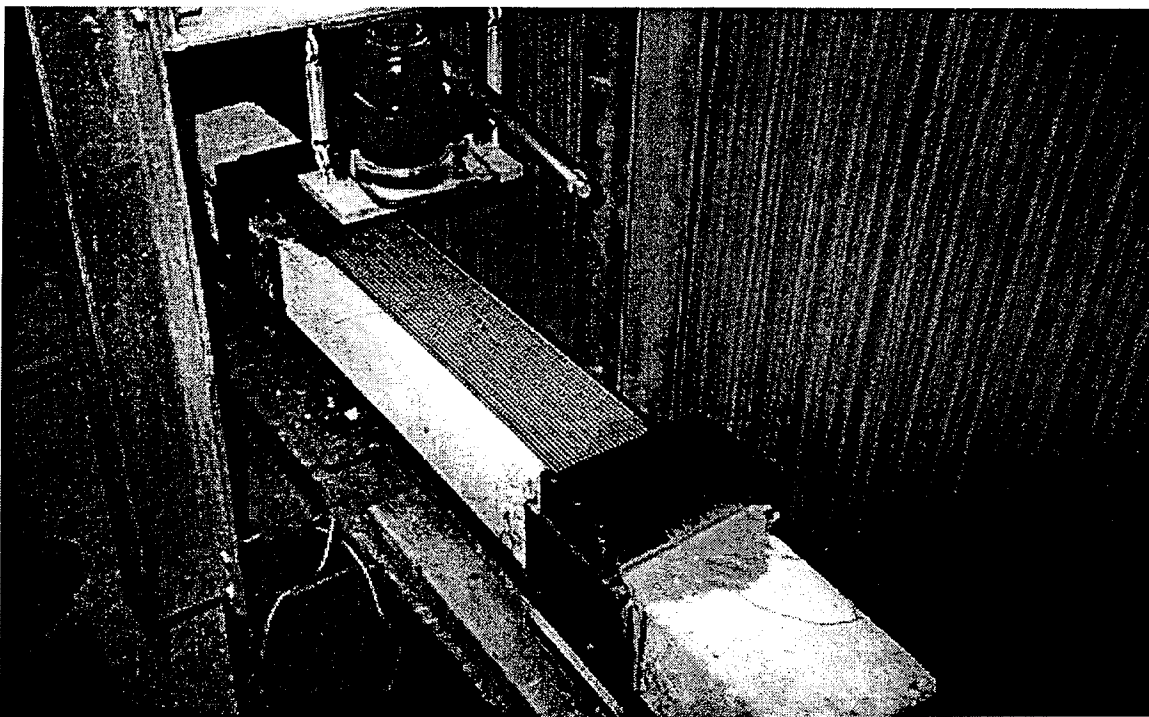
The Failed Beam with Large Crack Widths and Residual Deformations
